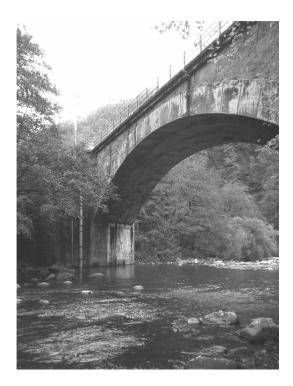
Porrettana railway. Single arch bridge in Pian di Reno
